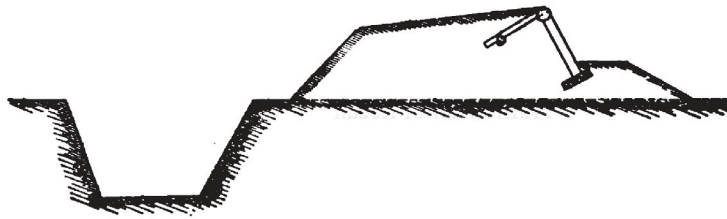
Site #7 The cross section of a field fortification showing the ditch or moat at left and the parapet section at right. The trench and mound ran from the gas works wall across the crest of the bluff to an area ending at the Kehoe Foundry's eastern section.
